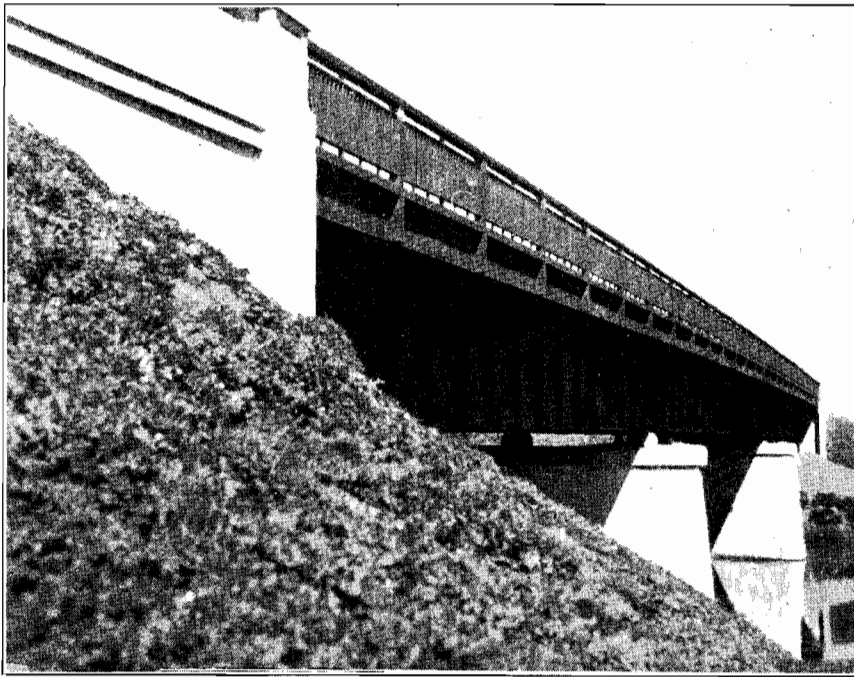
Showing the new bridge over the Ovens River at Wangaratta.
